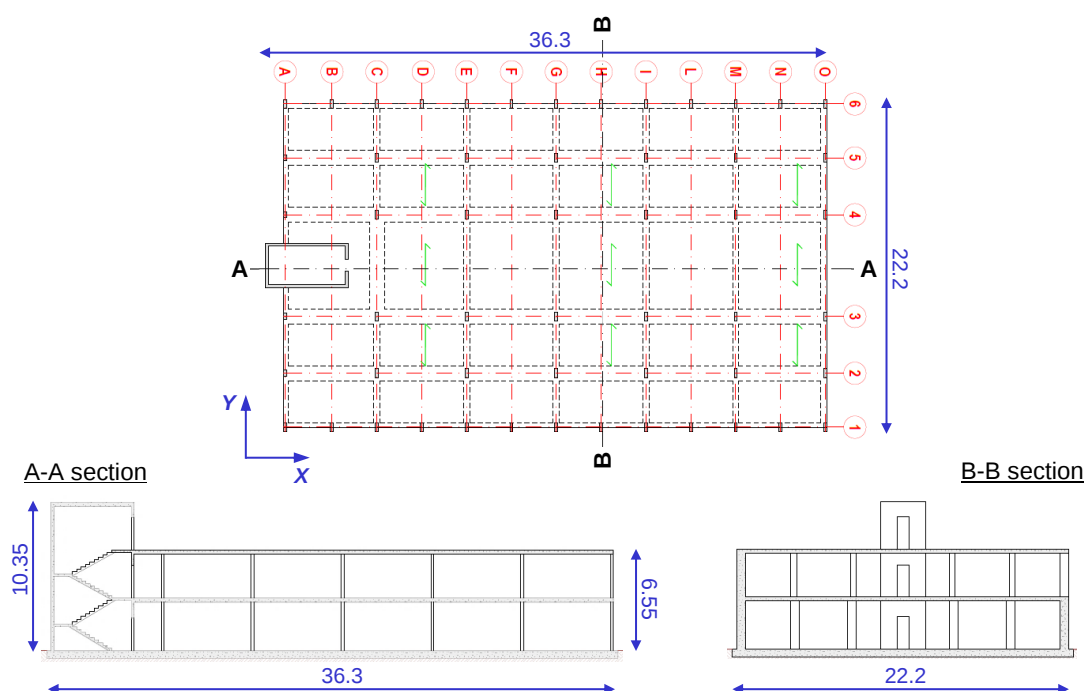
Ground storey structural plan, longitudinal and transversal sections of case study building in current state (dimensions in meters)
